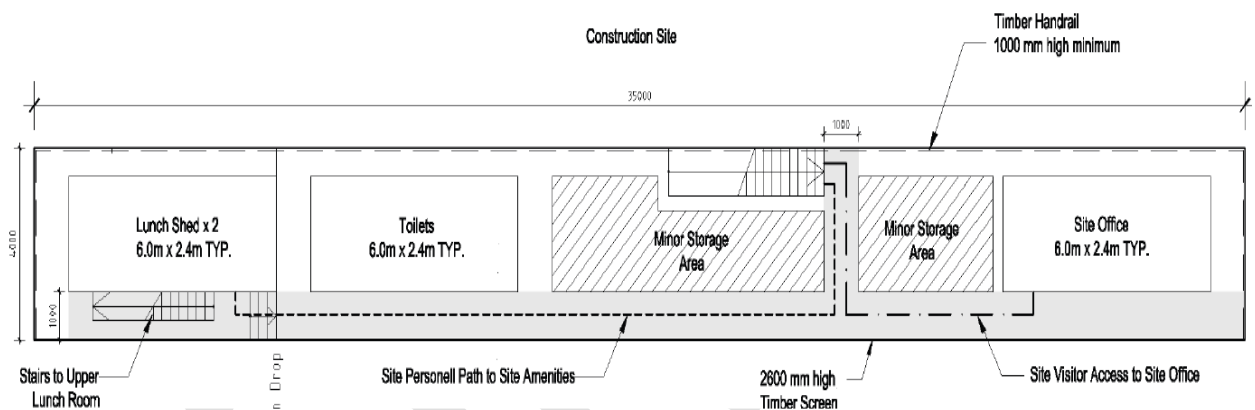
Diagram of typical Site Plan for Type B hoarding with Site Sheds. Representation of typical layout, indicative only
